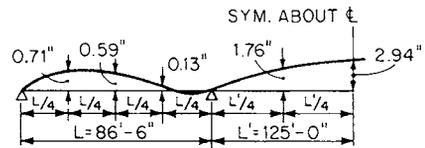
Camber of girder to offset dead-load deflections.
